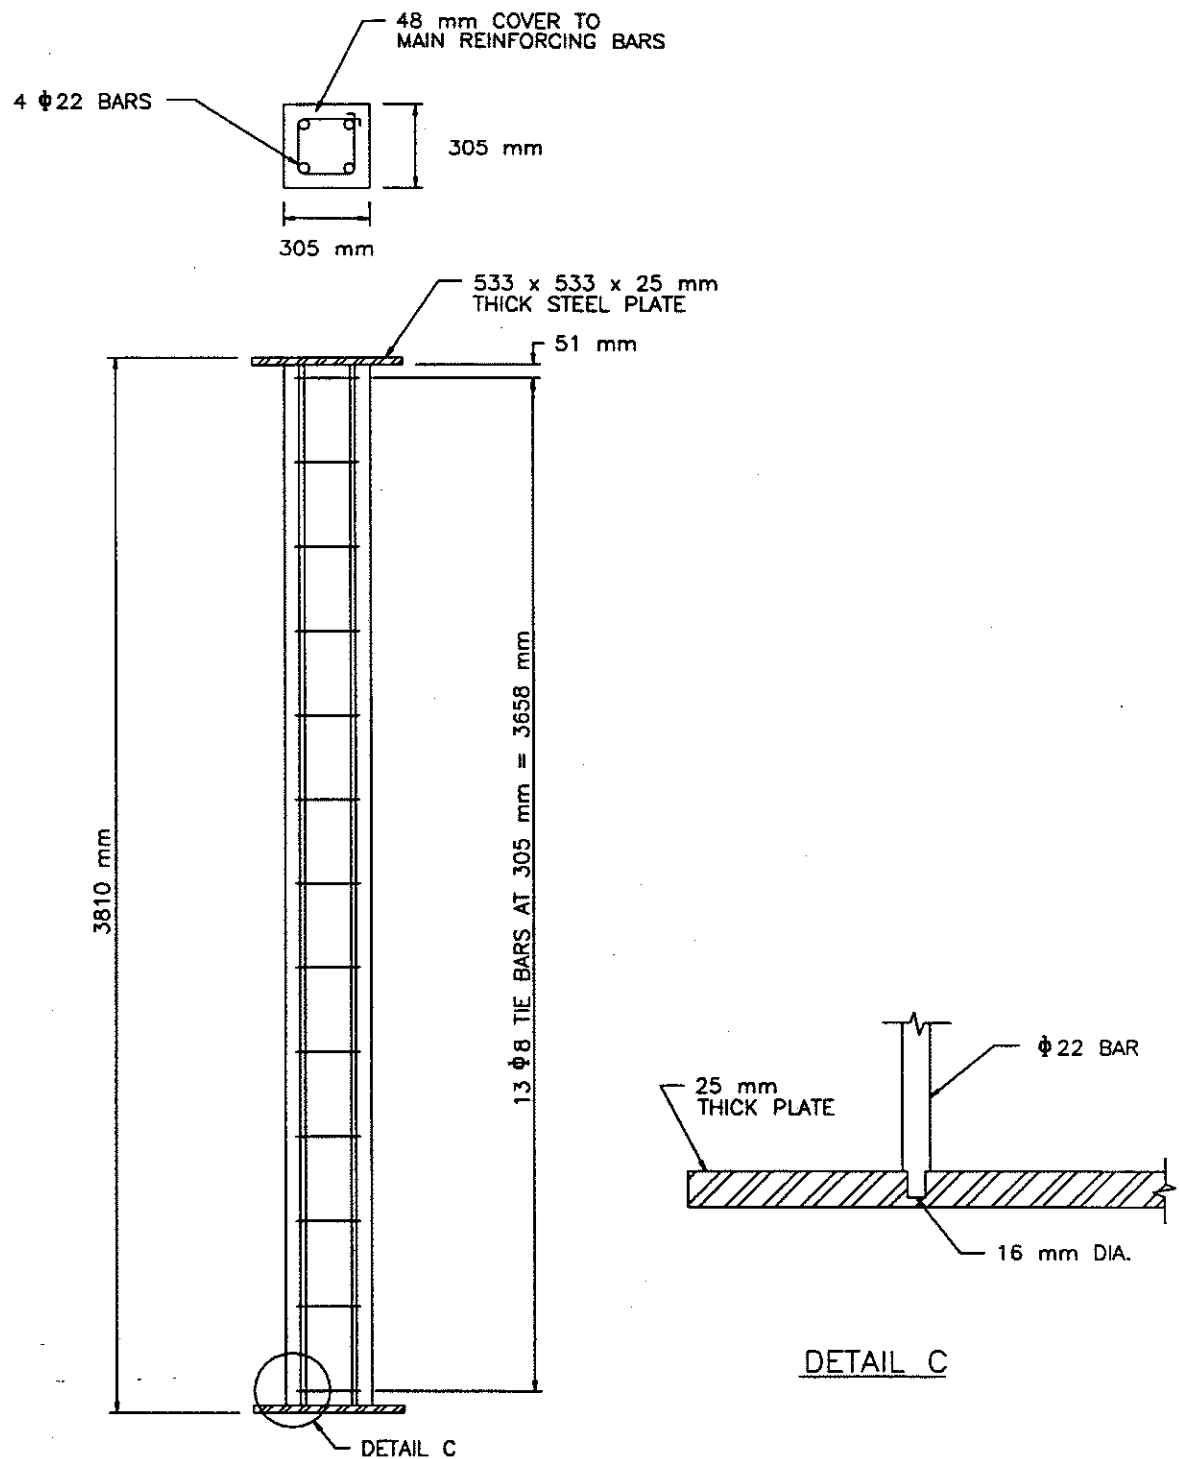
Elevation, Cross-Section and Finishing Detail:
